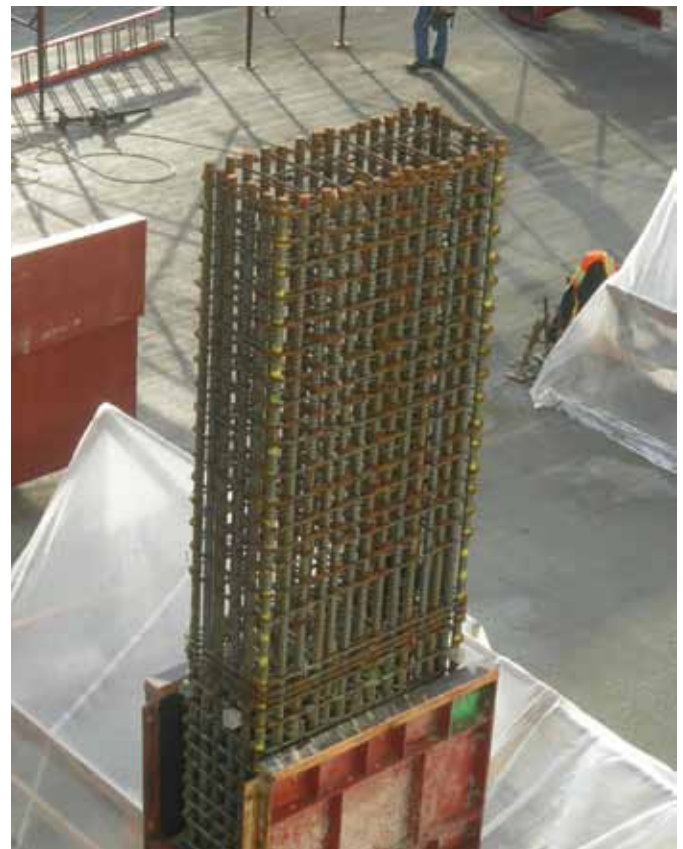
A column cage with many large vertical bars and crossies can be stable enough to eliminate the need for temporary bracing
